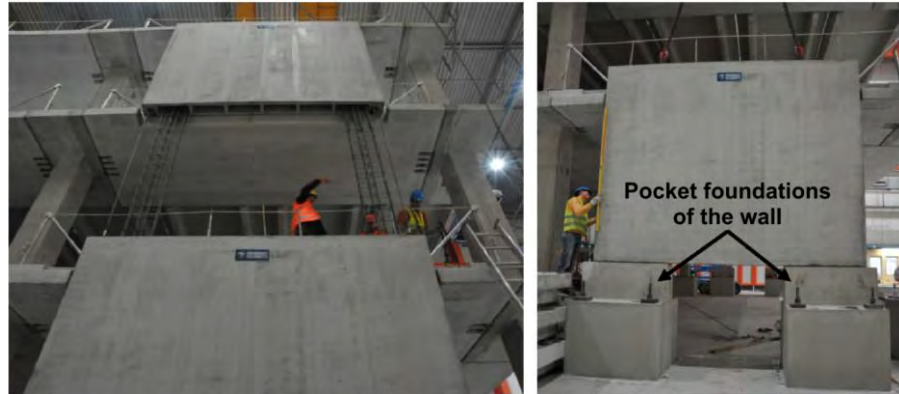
Shear wall of the SAFECAST building prototype [37]
